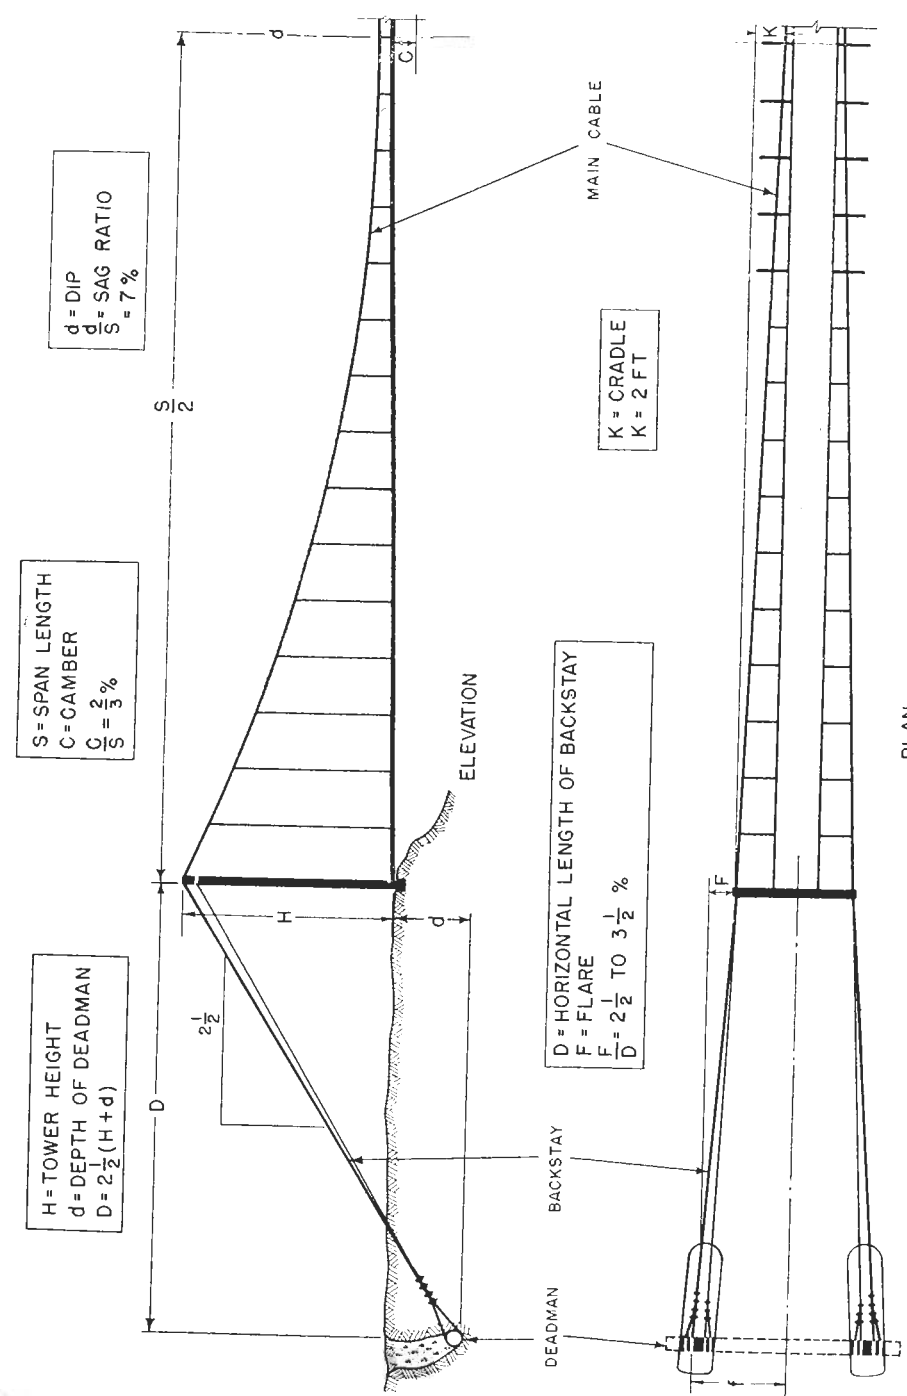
Design of main cables. Factors used in suspension-bridge design and construction.
